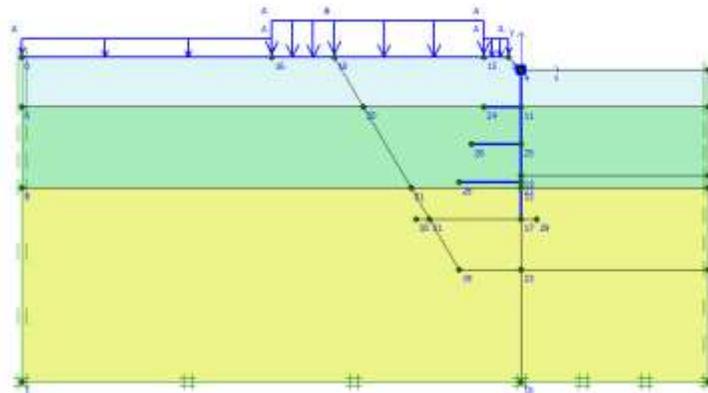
Modeling retaining wall without heel in PLAXIS software
